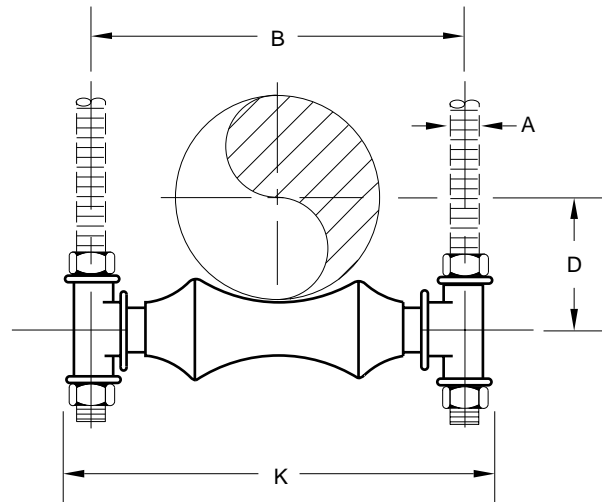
ADJUSTABLE ROLL SUPPORT
